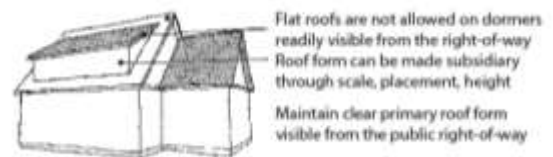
G: DORMERS AND SUBSIDIARY ROOFS
